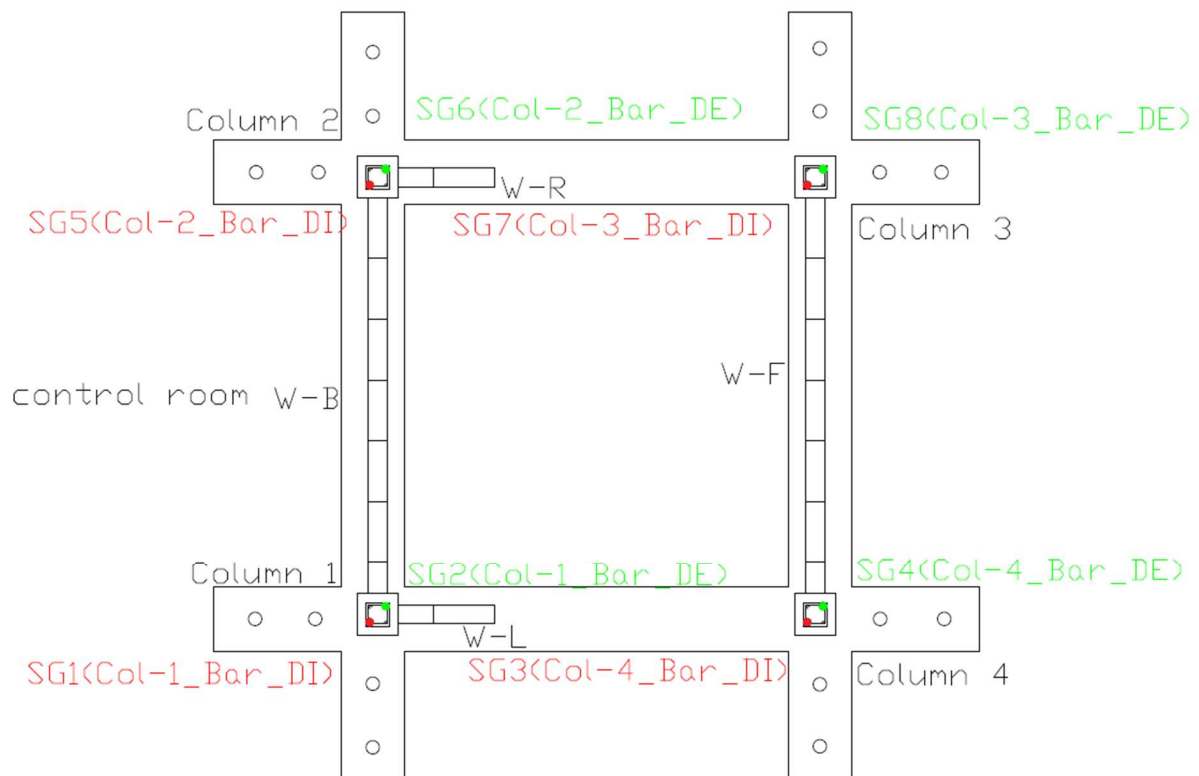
Floor plan with strain gauges at the bottom of the columns (DE)
